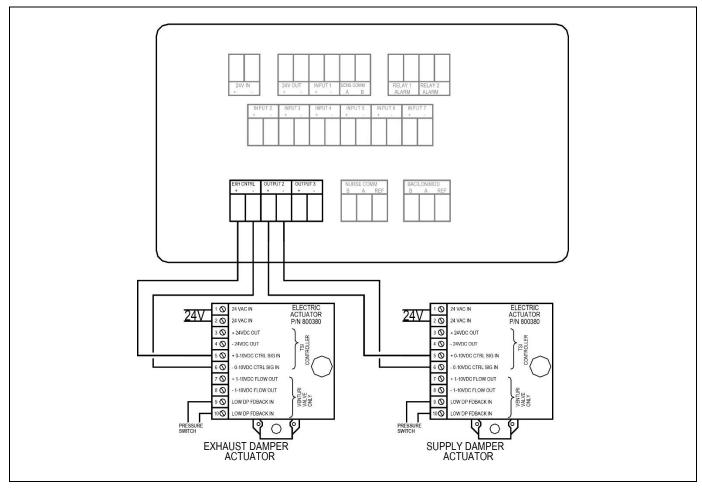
Optional Supply & Exhaust Actuator Wiring to Model RPC30
